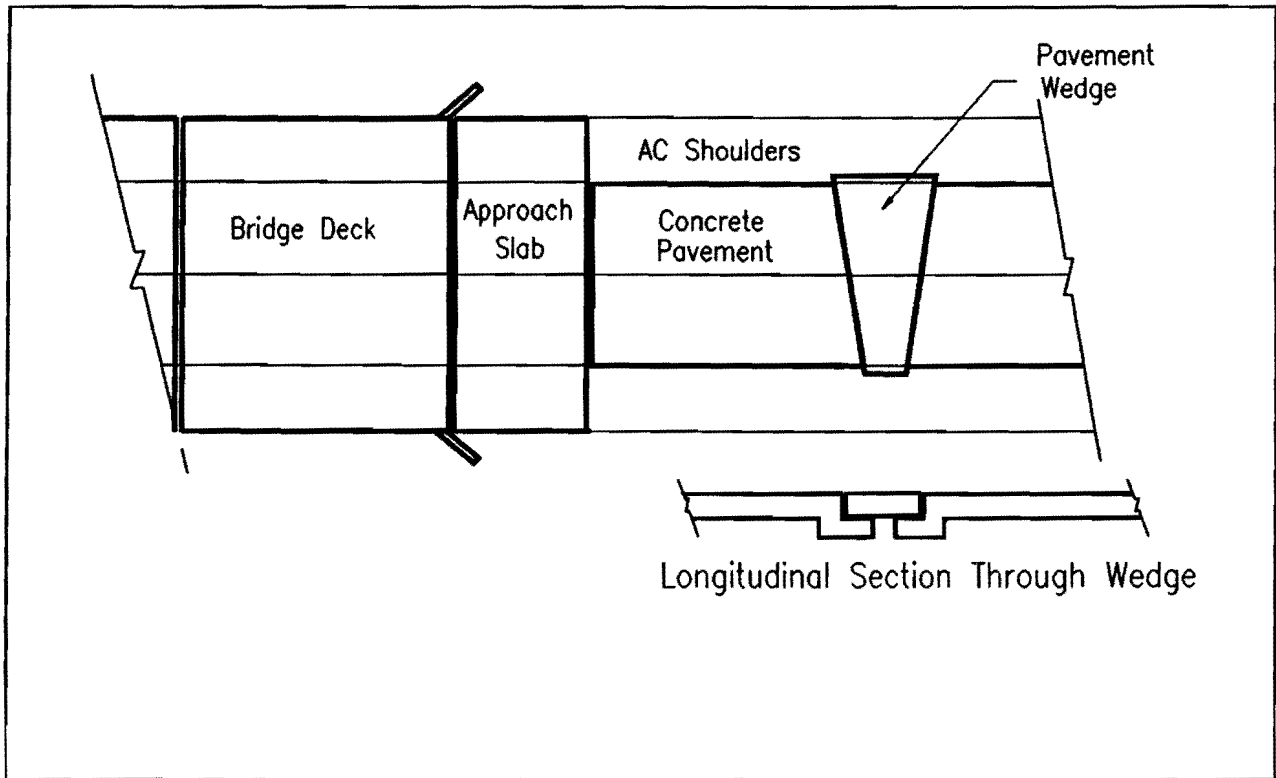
Proposed Wedge of Concrete Pavement Designed to Relieve Pressure of Pavement Growth (Panak 1990)
